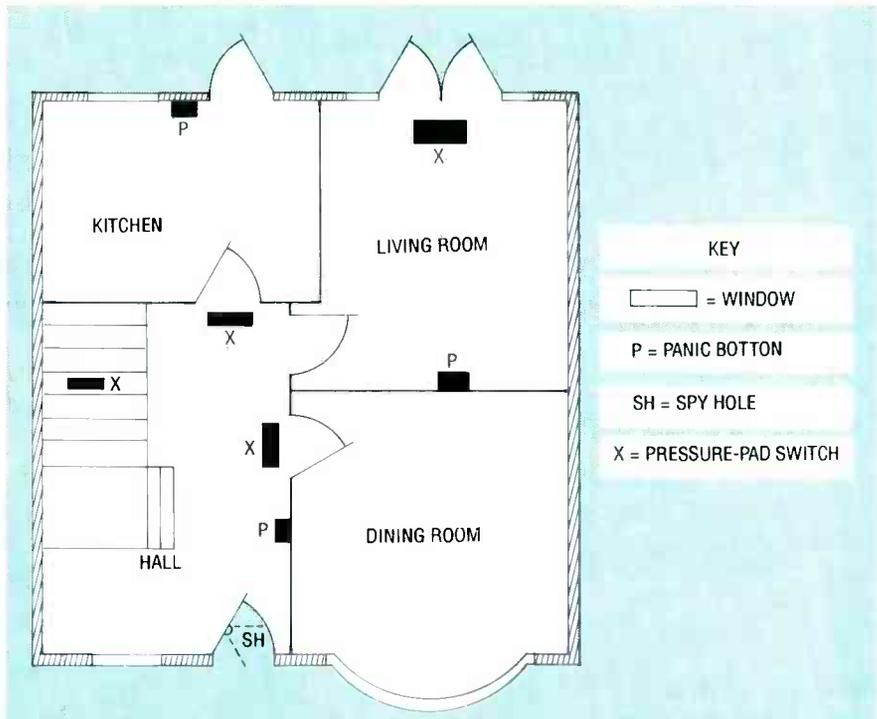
GROUND-FLOOR PLAN OF A MEDIUM-SIZED mid-terrace house with minimal spot and panic defenses.
